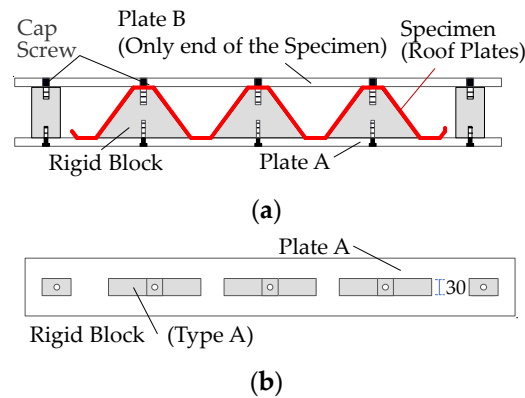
Connector at the edge of the specimen (a–a' line). (a) Elevation and (b) ground plan.
